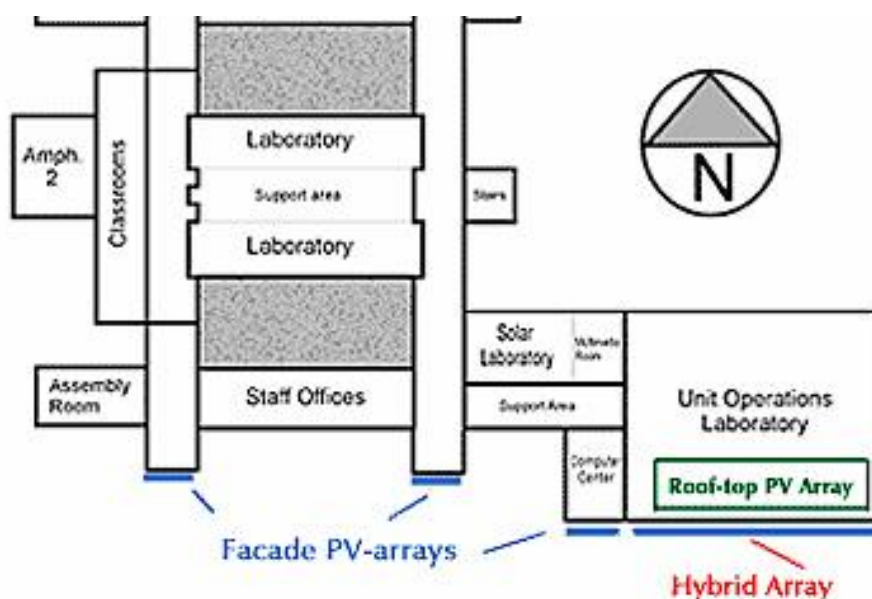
Ground plan of Chemical Engineering Building where PV arrays are placed
